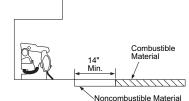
Minimum Fireplace Clearances If Installed at Floor Level
